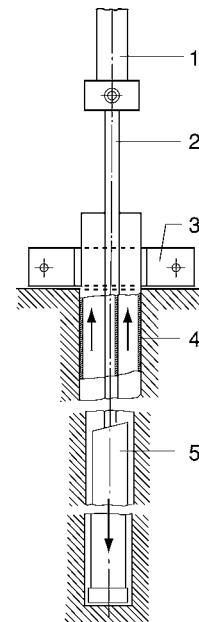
Detail of direct flushing tubular drill rod. 1, Drill head; 2, drill stem; 3, casing clamp; 4, casing; 5, core drilling string.
